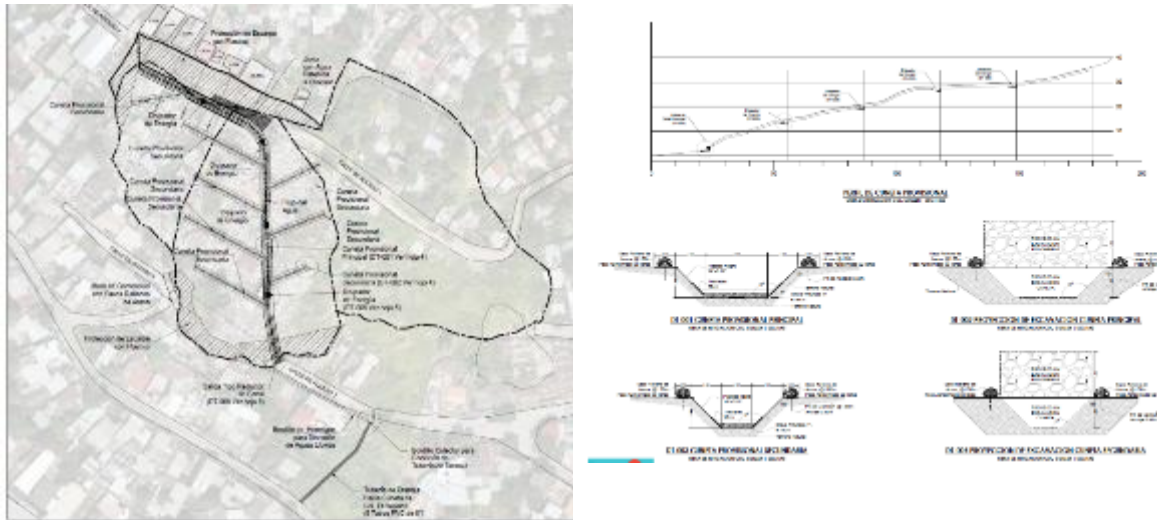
Design drawing for emergency countermeasures (La Guillen)
